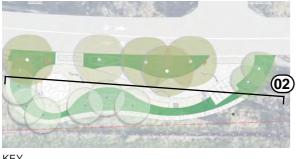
Indicative section through the Dobroyd Drive rest area
